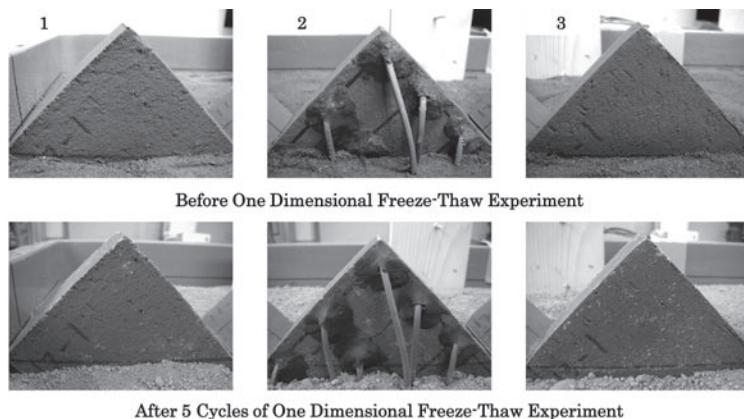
Appearances of bricks before and after one dimensional freeze-thaw experiment.
